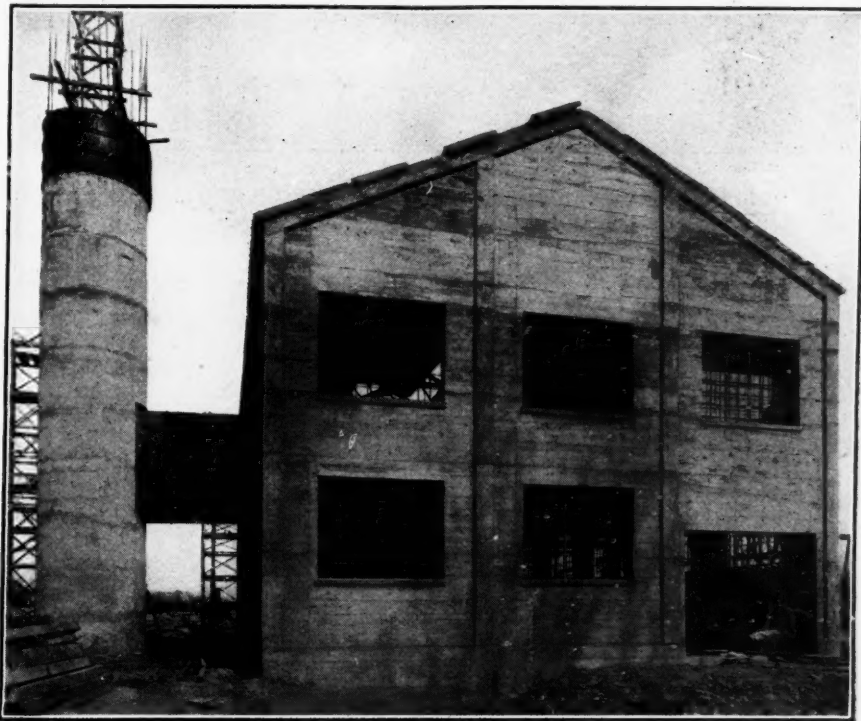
BOILER HOUSE AND STACK, UNDER CONSTRUCTION
